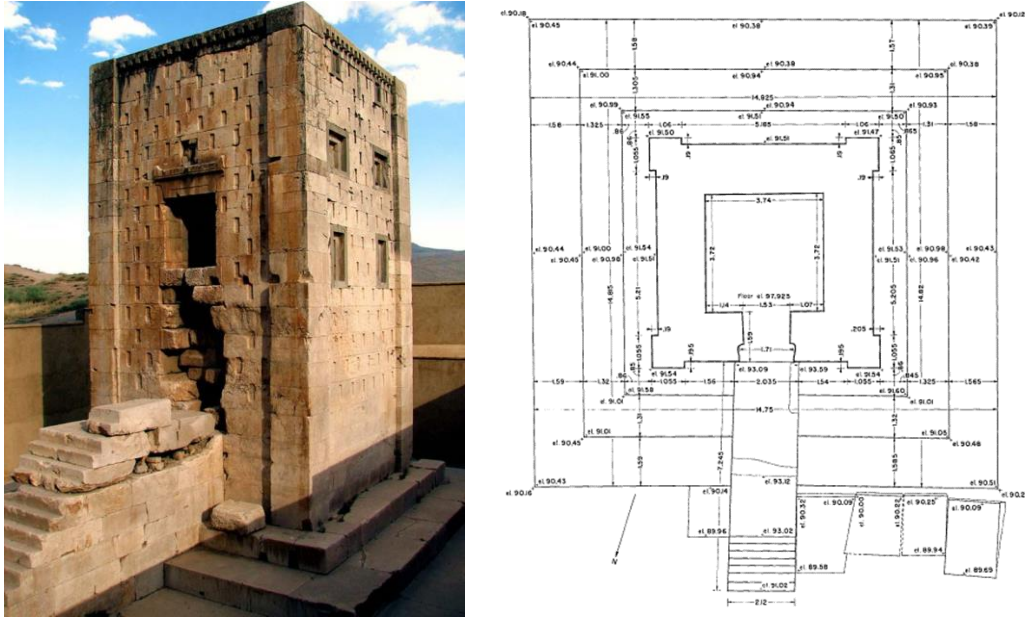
(a) Northwest view, and (b) plan of the Achaemenid tower (Schmidt 1970)
